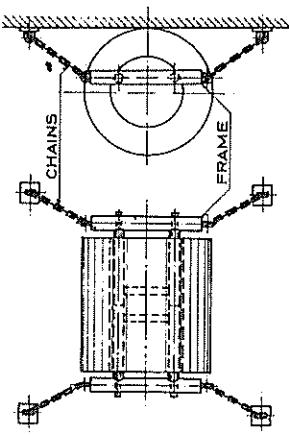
(c) Installation Arrangement for Hollow Cylindrical Fenders
